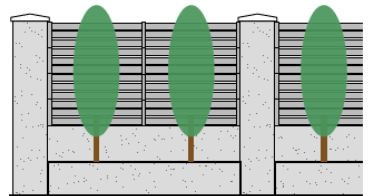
Non-permeable fencing – rendered masonry pier and low wall with integrated planter. Solid infill panel above
